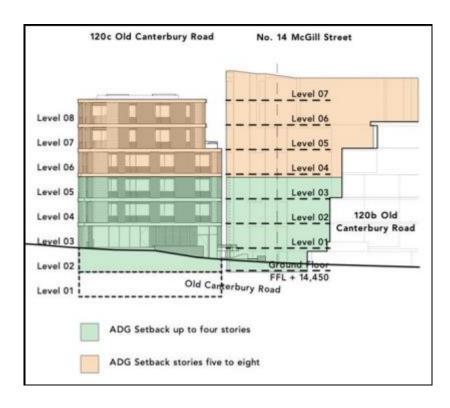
Height Blanket - Looking from the Old Canterbury Road towards the site
